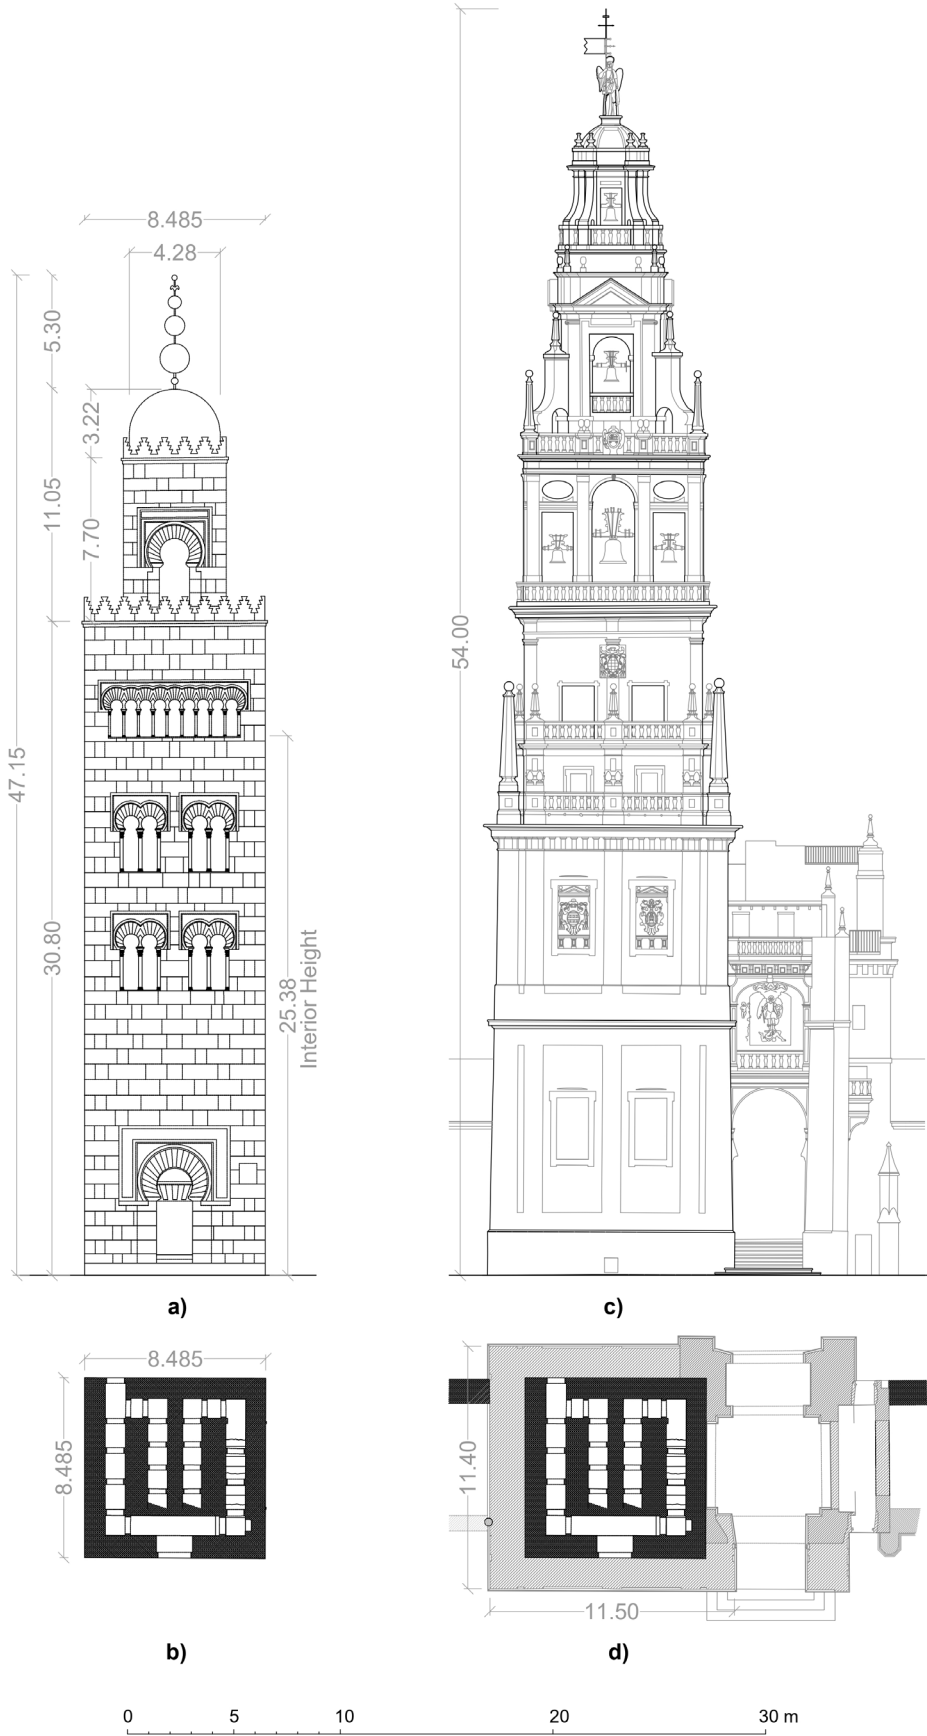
Ground plans and south elevations of the caliphal minaret and the present Bell Tower: (a) south elevation of the original minaret; (b) ground plan of the original minaret; (c) south elevation of the current Bell Tower; (d) ground plan of the current Bell Tower, showing their geometric relationship (drawing by the author, based on Almagro, 2019).
